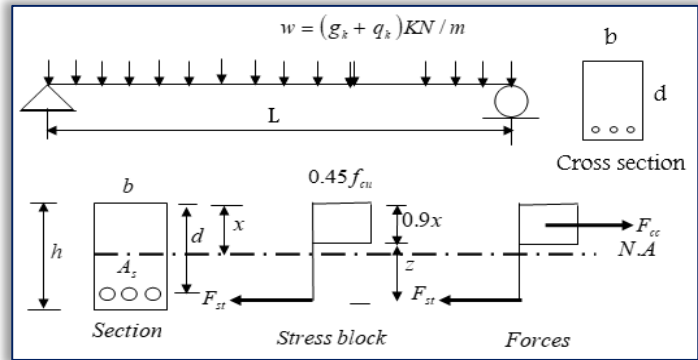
A singly reinforced concrete beam under uniform loading and assumed stress distribution
